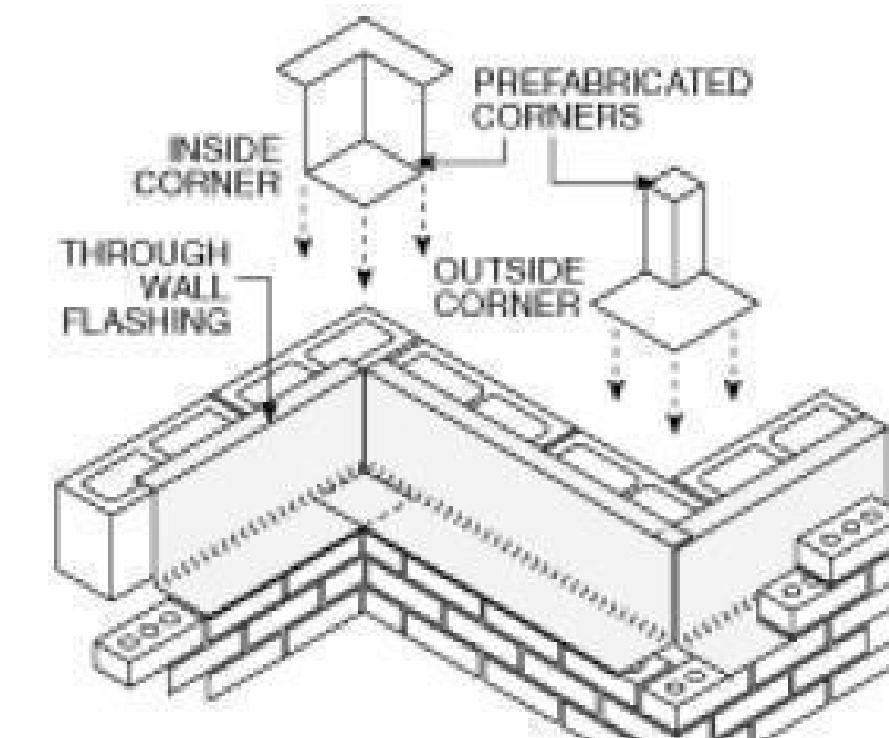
DETAILS AND NOTES AS PER BRICK INDUSTRY ASSOCIATION TECHNICAL NOTES ON BRICK CONSTRUCTION DOCUMENT 21-B
